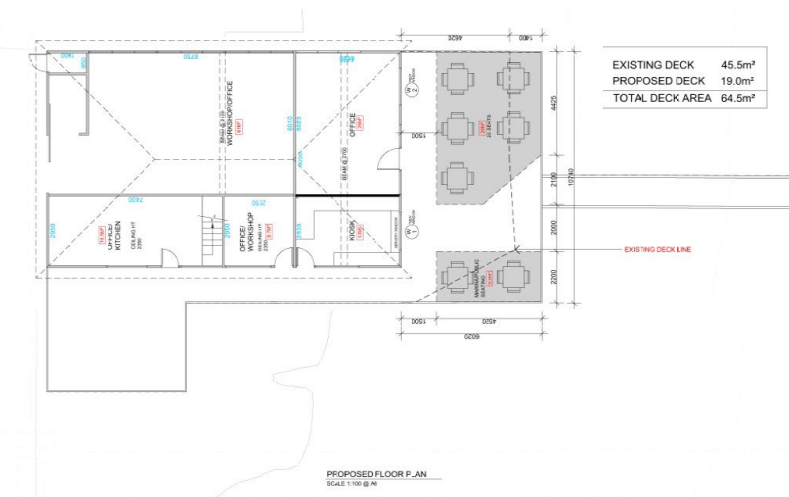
PROPOSED KIOSK AND DECK EXTENSION
